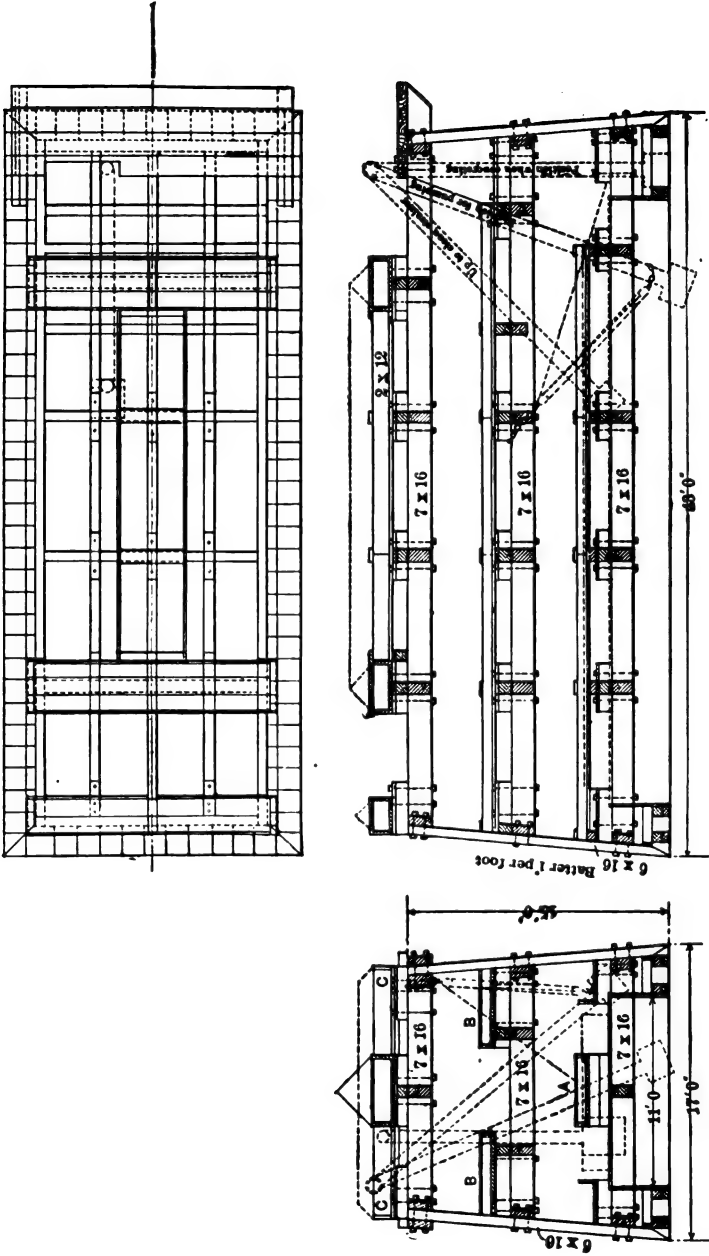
CRIB COFFER-DAM, ATCHISON, TOPEKA AND SANTA FE RAILWAY.
